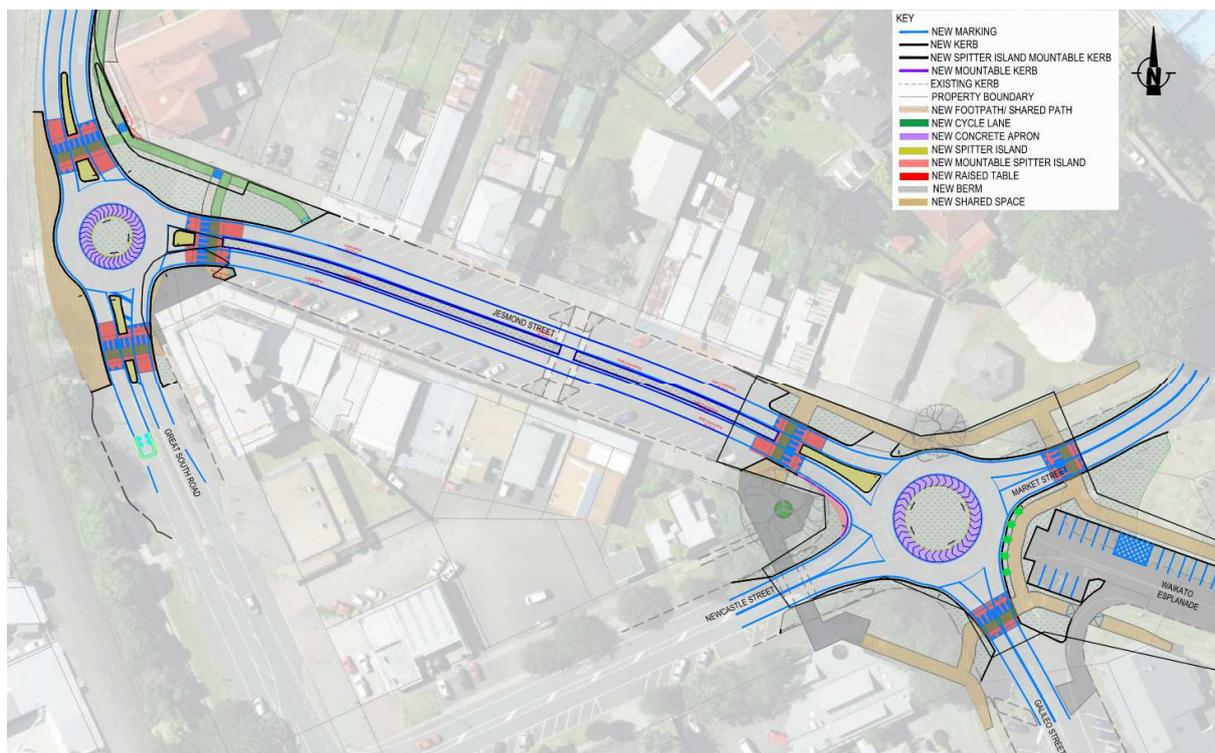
Overall site plan – GSR/ Jesmond St Intersection and the 5-legged Roundabout Proposed Upgrade
